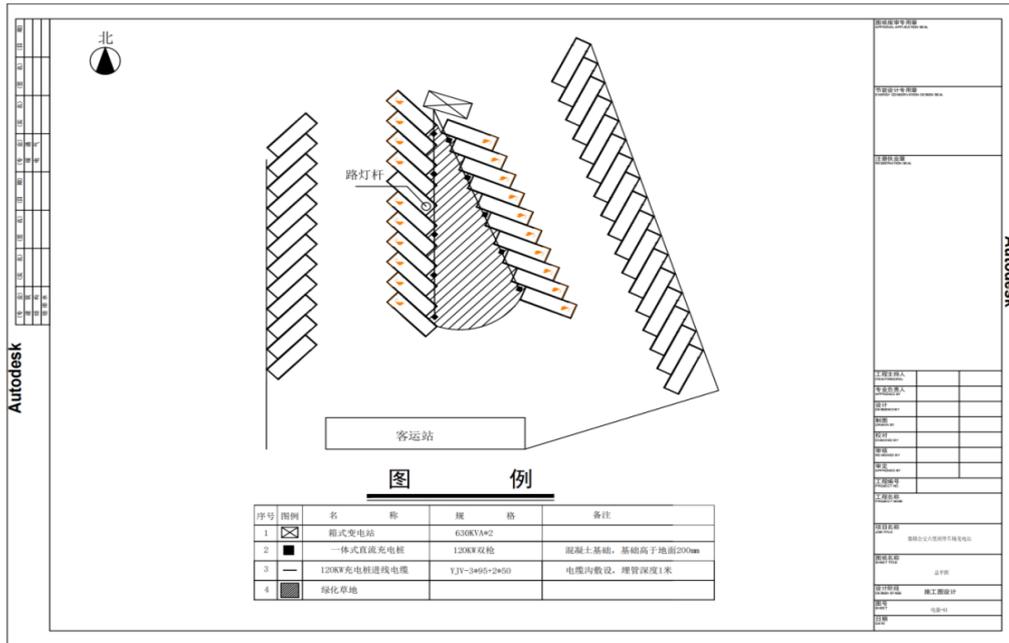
Layout of the charging piles in the Liulihe parking lot of Panjin Public Transport
